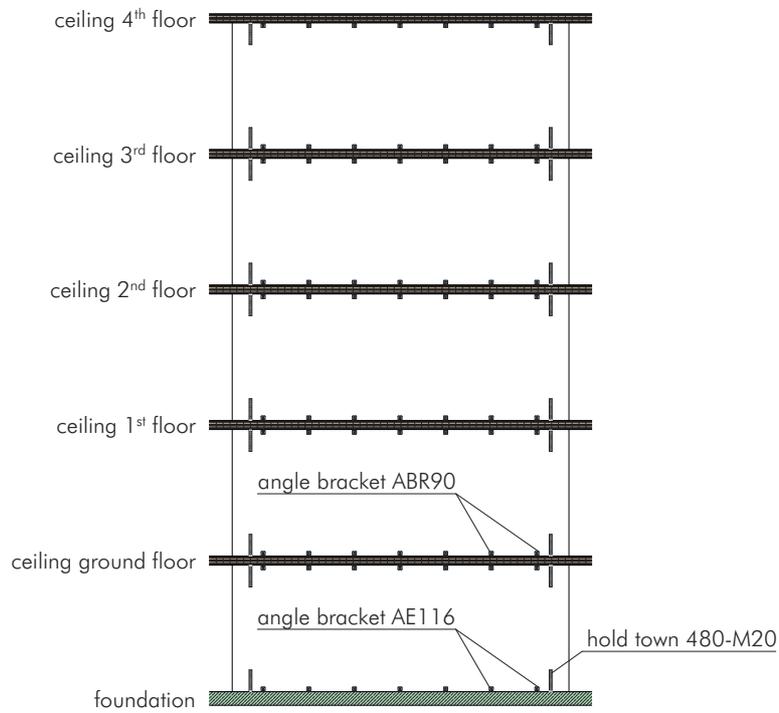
organisation of connectors in the connection joints within the prevailing floors
